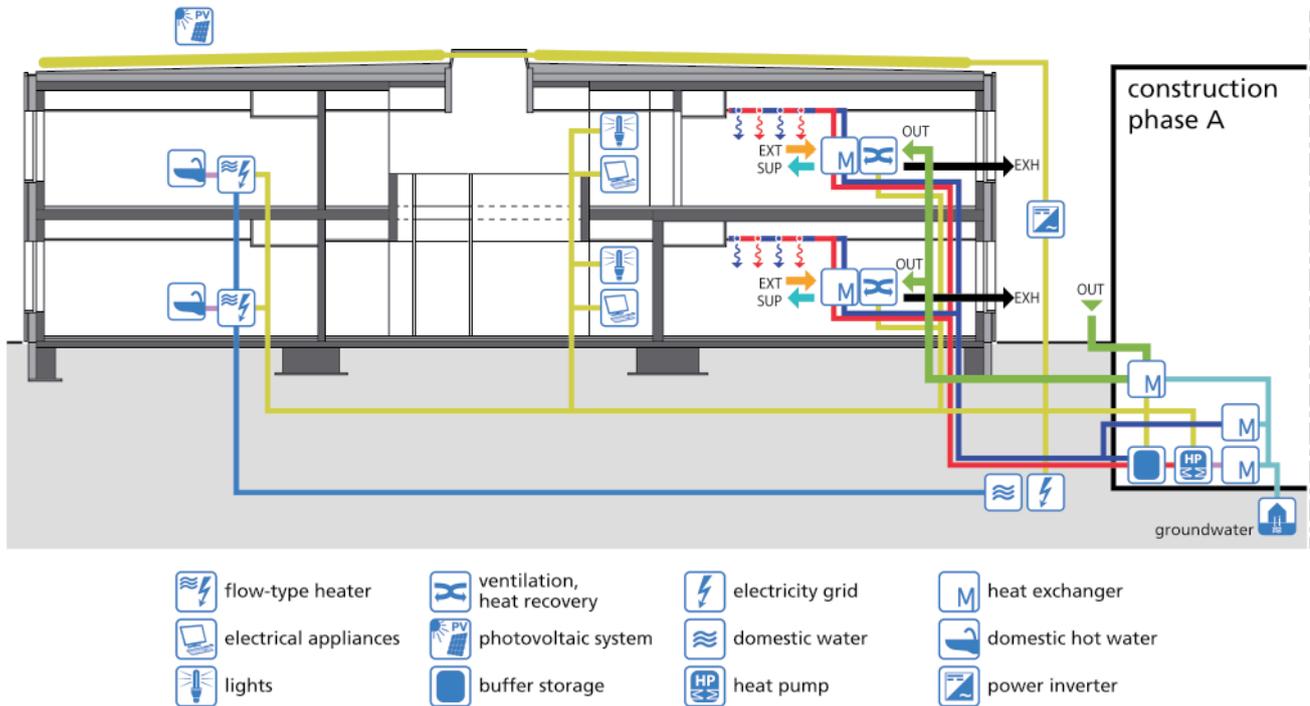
Longitudinal section through the new build (Building B) and design of building services
